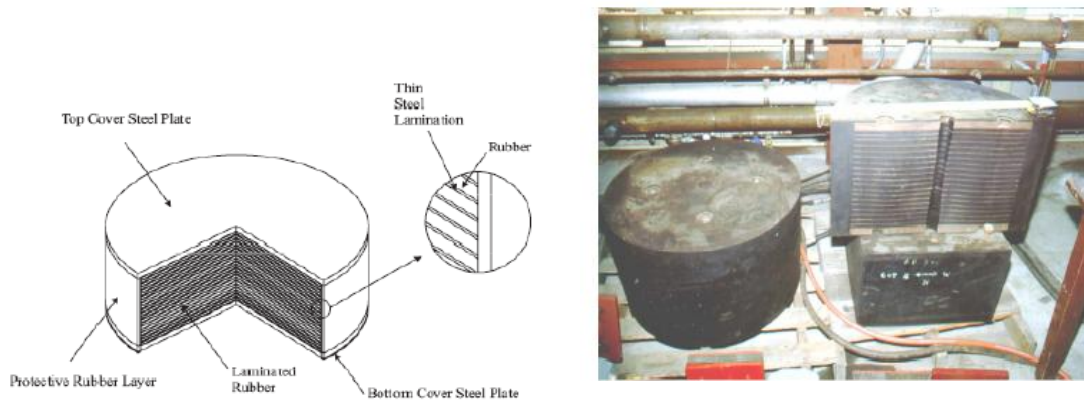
Schematic of Laminated Rubber Bearing and Example of Laminated Rubber Bearing [1]
